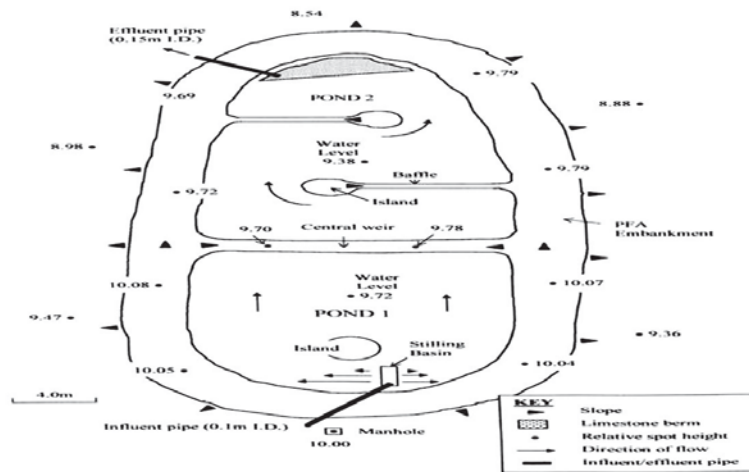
Proposed Structure with construction materials for Pond 1 and Pond 2
